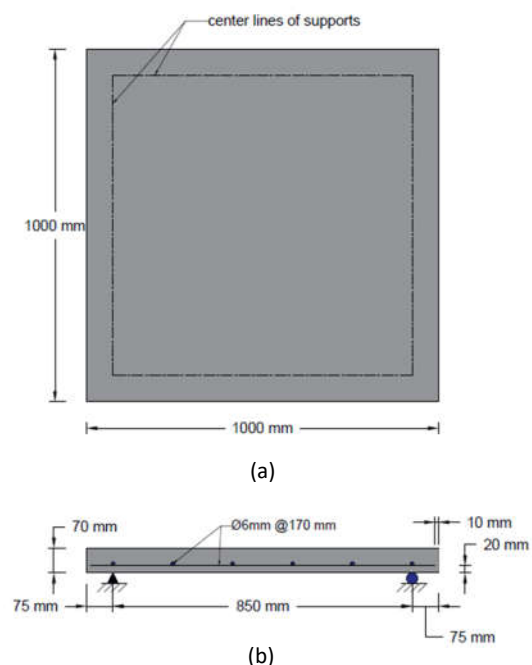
Dimensions and other details of the slab specimens: (a) Top view, (b) Sectional view.
